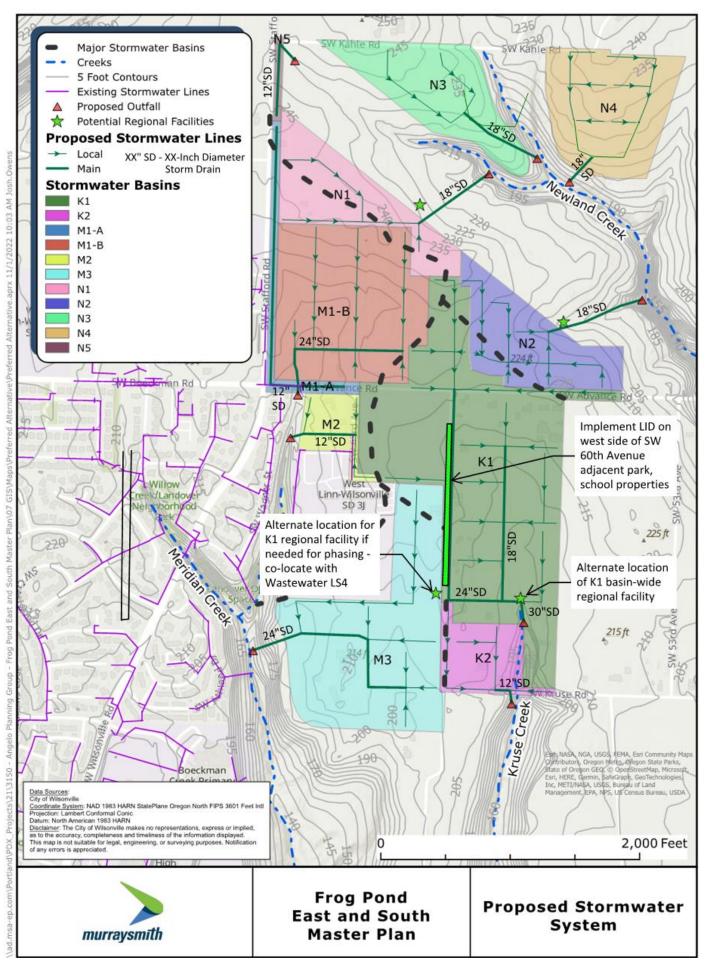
shows the proposed preliminary stormwater system coordinated with the Master Plan's street layout and land uses. For conveyance, the plan designates a stormwater main for each drainage basin, extending from the outfall into the basin. Storm mains will be constructed with the other key infrastructure needed to support development. Developments will be required to provide full stormwater management prior to connecting and discharging into the storm main.
